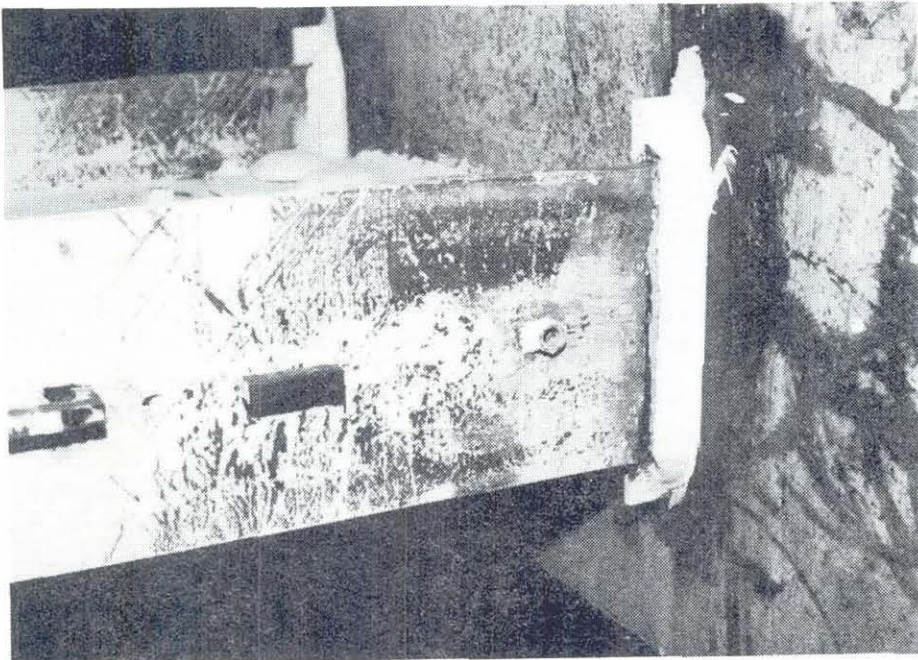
Fracture of Beam Top Flange (Specimen 17)
